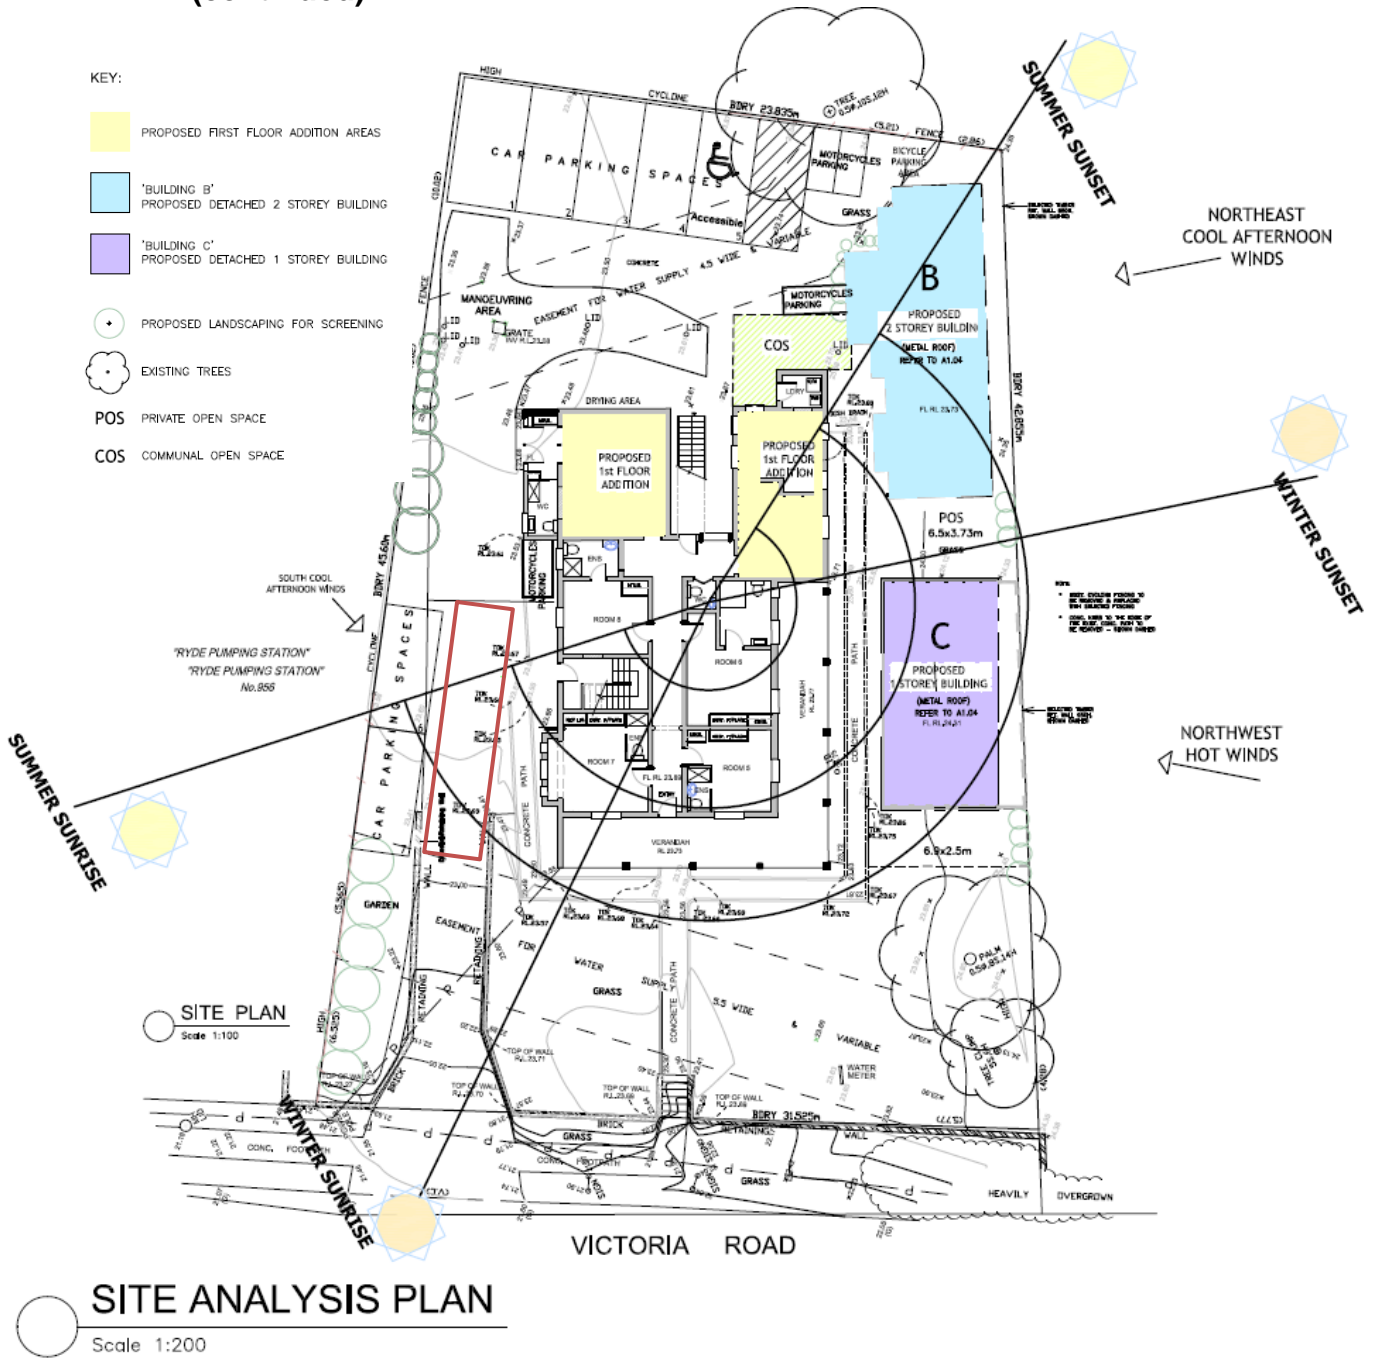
Site Analysis Plan (Source: Gus Fares Architects, Drawing No. DA/A001, June 2018 Issue A)
